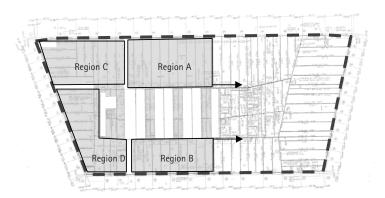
Horizontal loading on intact floor slab as floor areas tributary to Columns 76, 77 and 78 begin to collapse (perimeter moment frame shown with dashed line)
